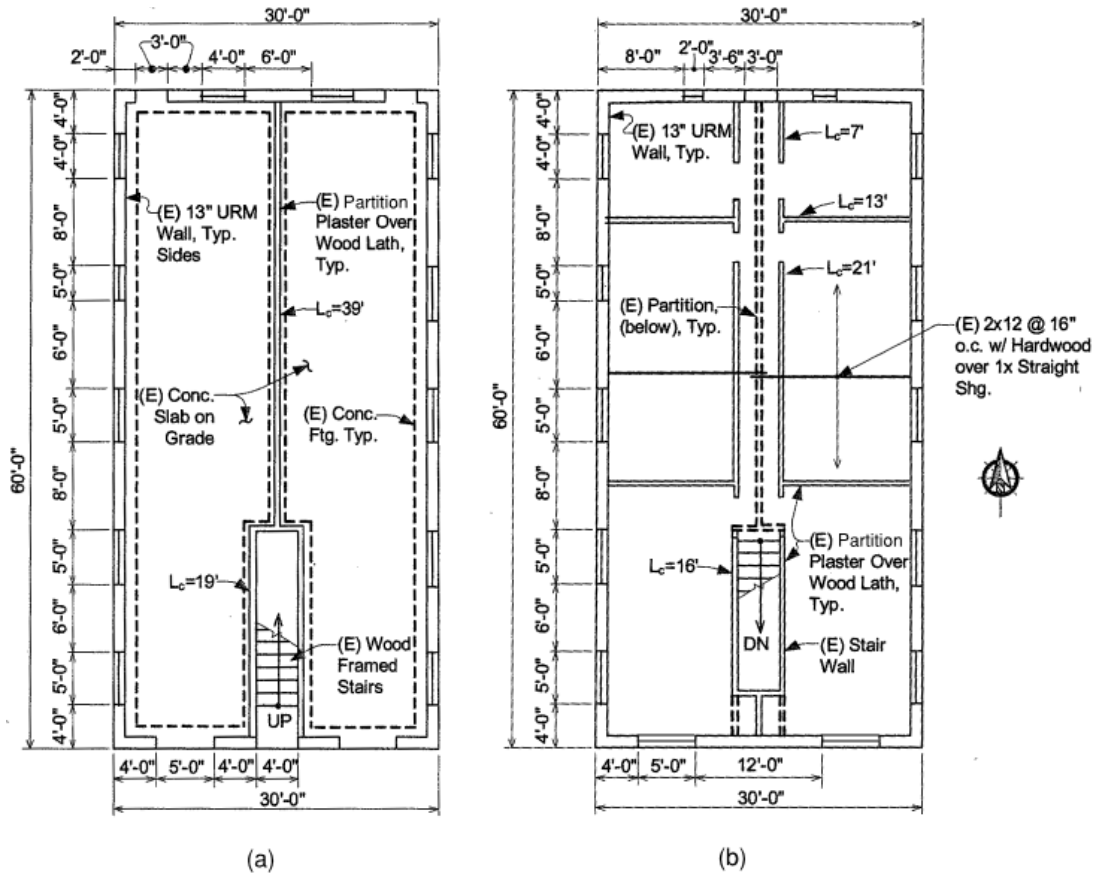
Example building plans for (a) first floor and (b) second floor.
